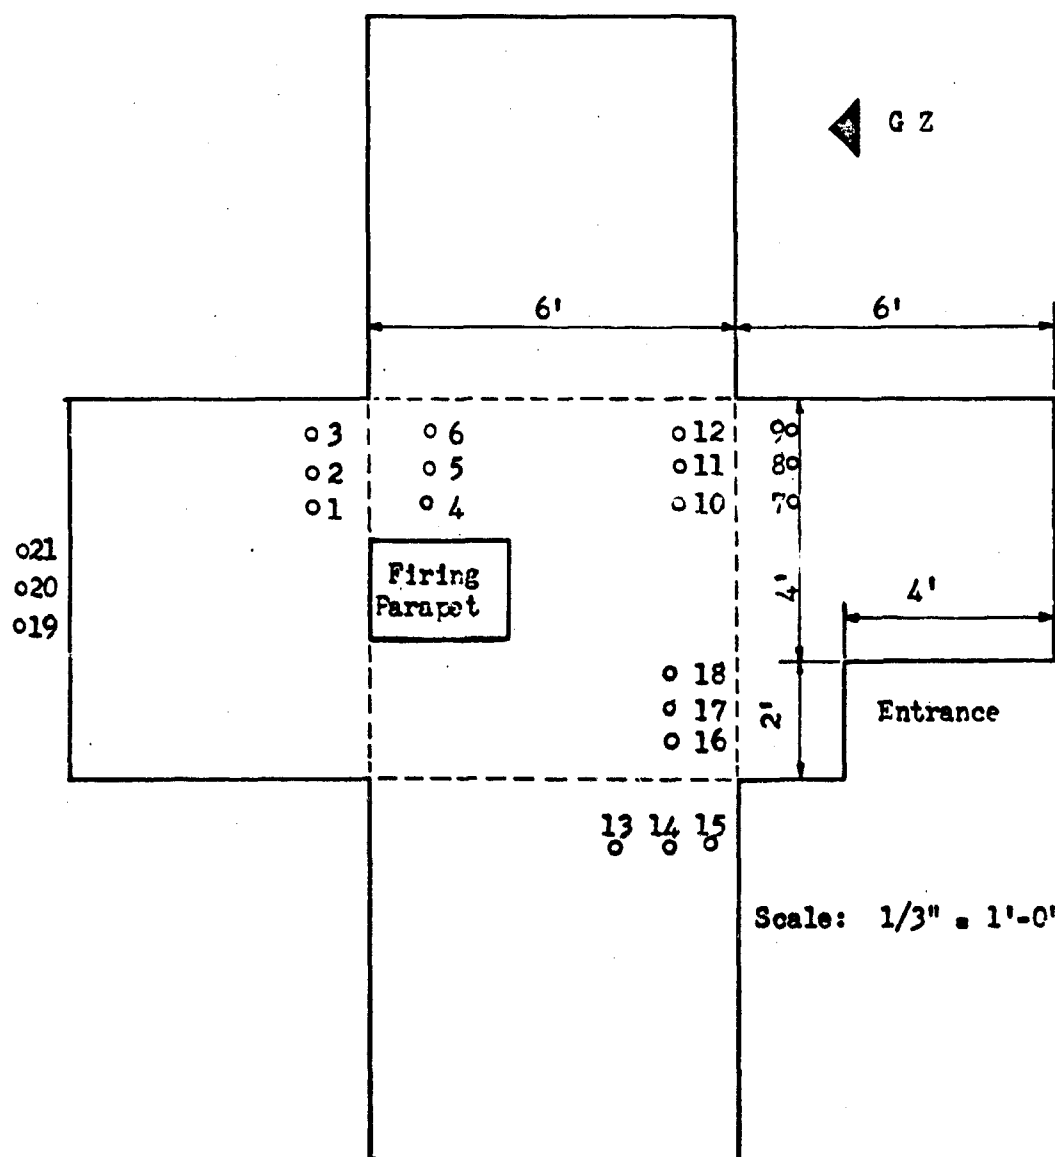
Gage Positions - Machine Gun Emplacement
